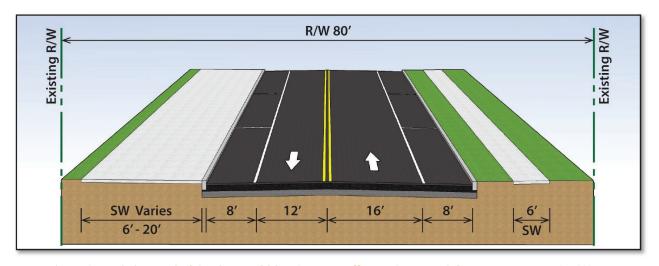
Existing Typical Section – Whiting Street – Jefferson Street to Selmon Expressway (SR 618)
